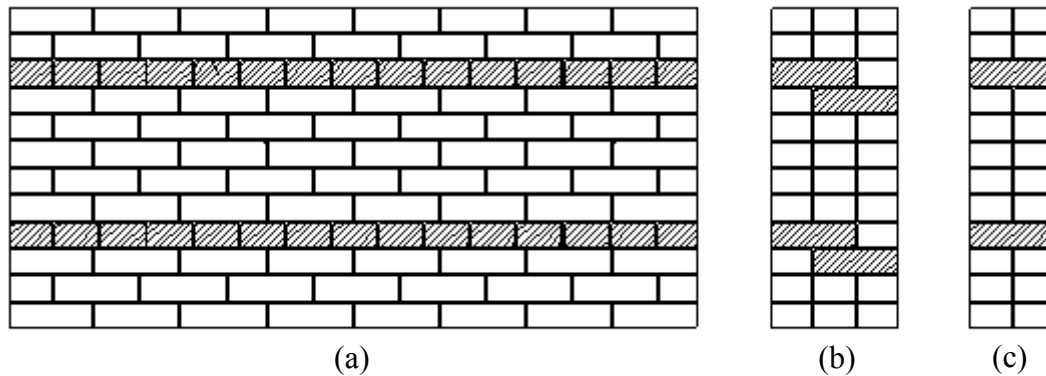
Detail of standard american bond (a) face of URM wall, (b) end of three-wythe URM wall, (c) end of two-wythe URM wall.
